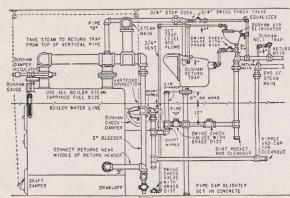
B Typical boiler connections for Dunham Return Trap No. 10A
